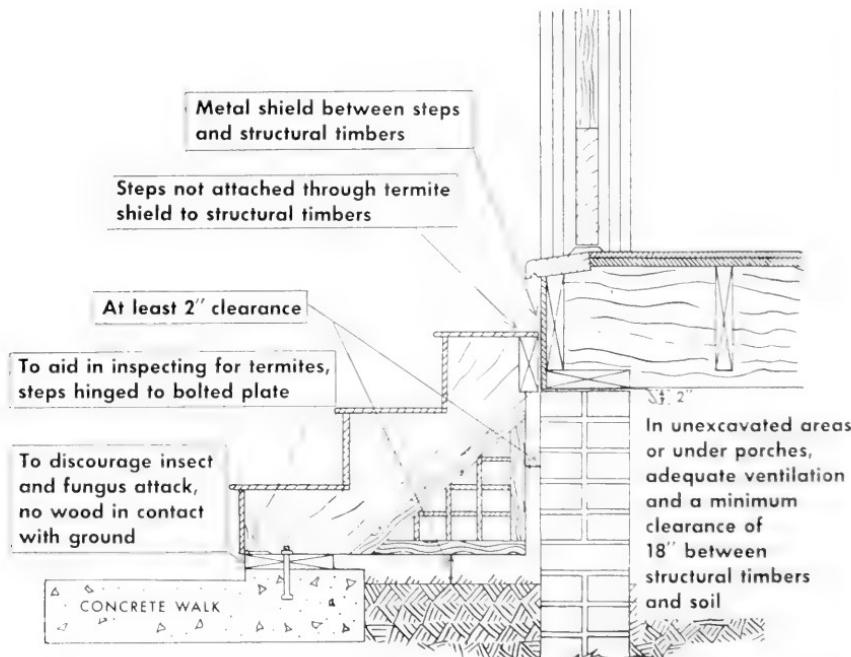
Steps and lattices, as well as ground-level doors and windows, all of which are possible avenues of entrance for termites to structural timbers, should be so constructed, or reconstructed, that no wood is in contact with soil. Special emphasis should be placed on inspection of these features at the time the entire structure is examined semiannually for the presence of termites.
